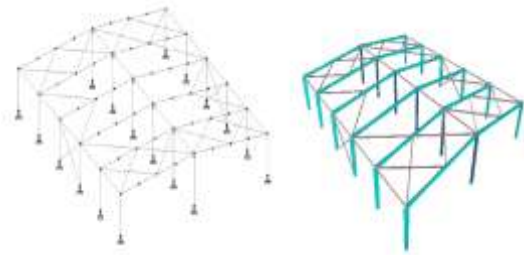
Elevation and 3D model of PEB Structure with Intermediate Support.
